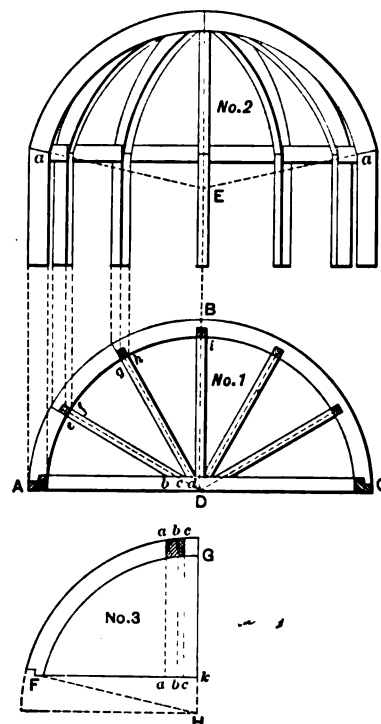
Framing a Niche Semicircular in Plan and Segmental in Elevation.
